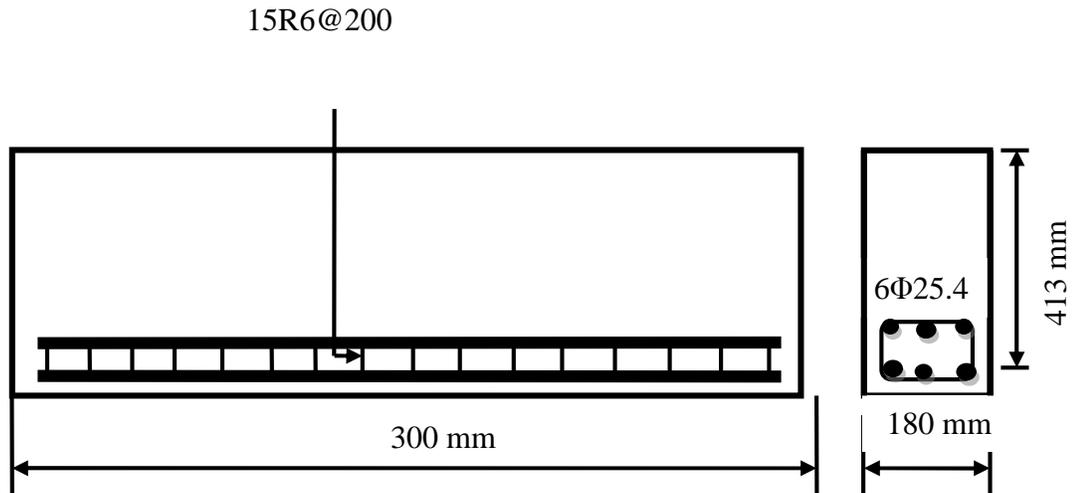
Longitudinal and Cross-Section of the Mangrove Reinforced Concrete Beam
